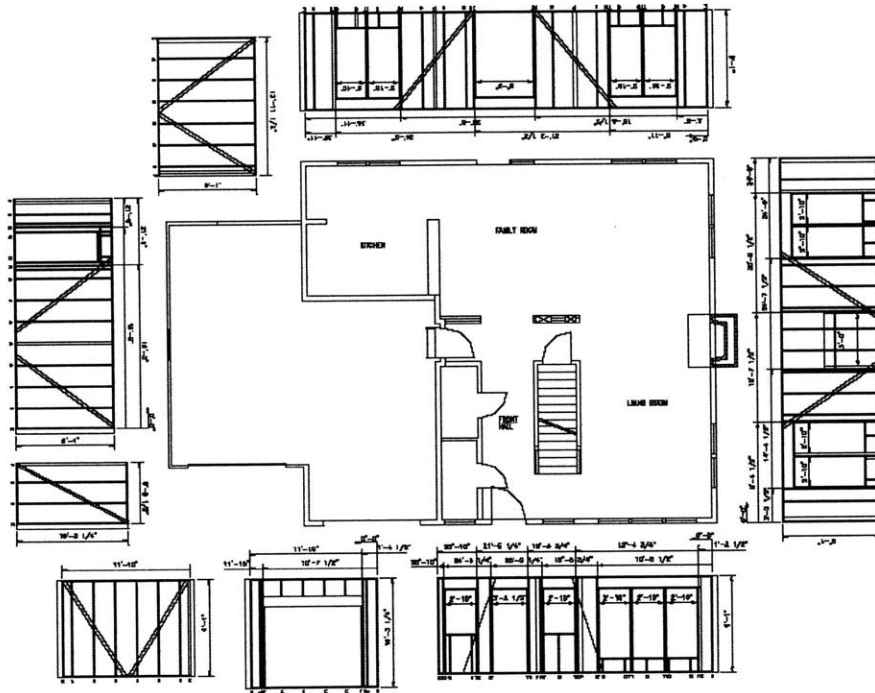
Wall Framing Plan (source: Building Science Corporation)
